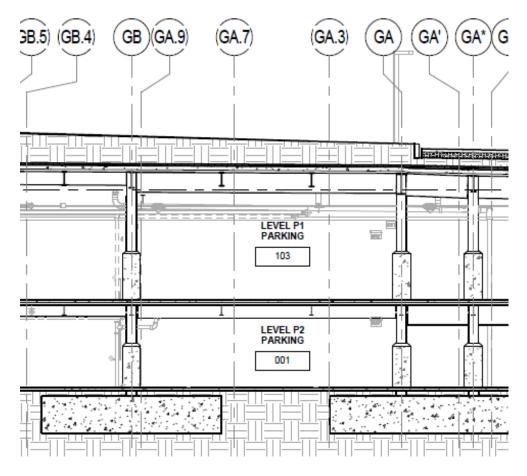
Partial Elevation in Architectural Drawings, (Gateway)
